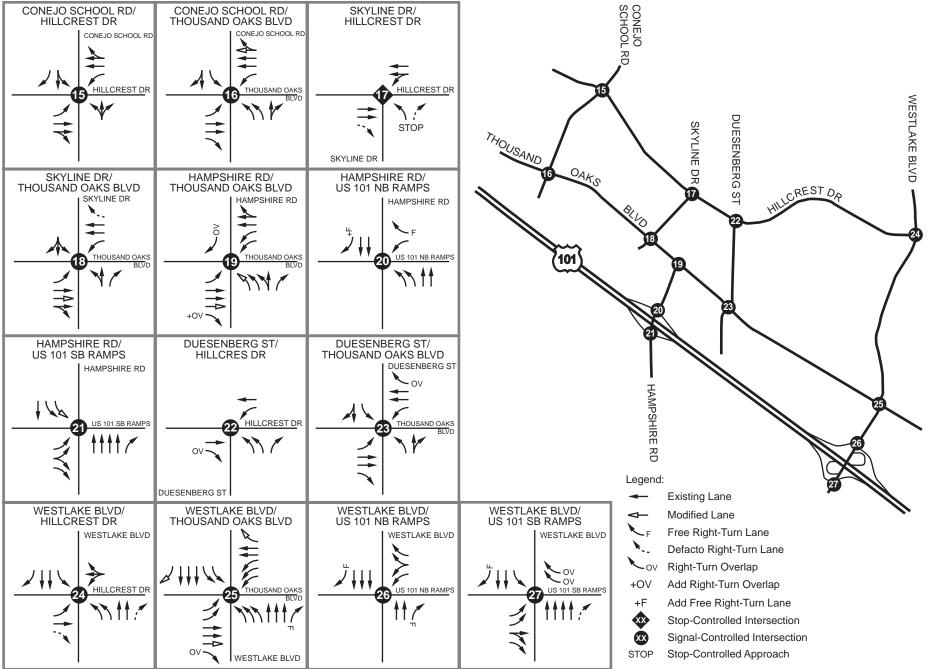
and 37 show the mitigated forecast General Plan land use buildout with proposed Downtown Alternative conditions study intersection geometry.
